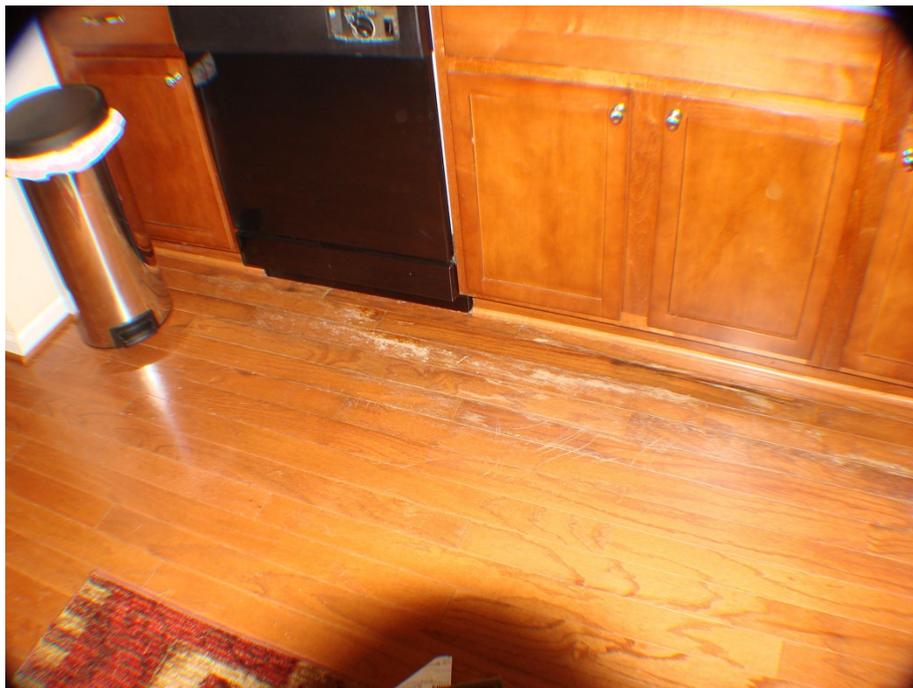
The water from a leak tends to run under the finished floor towards a low part – usually the center – of a room.
